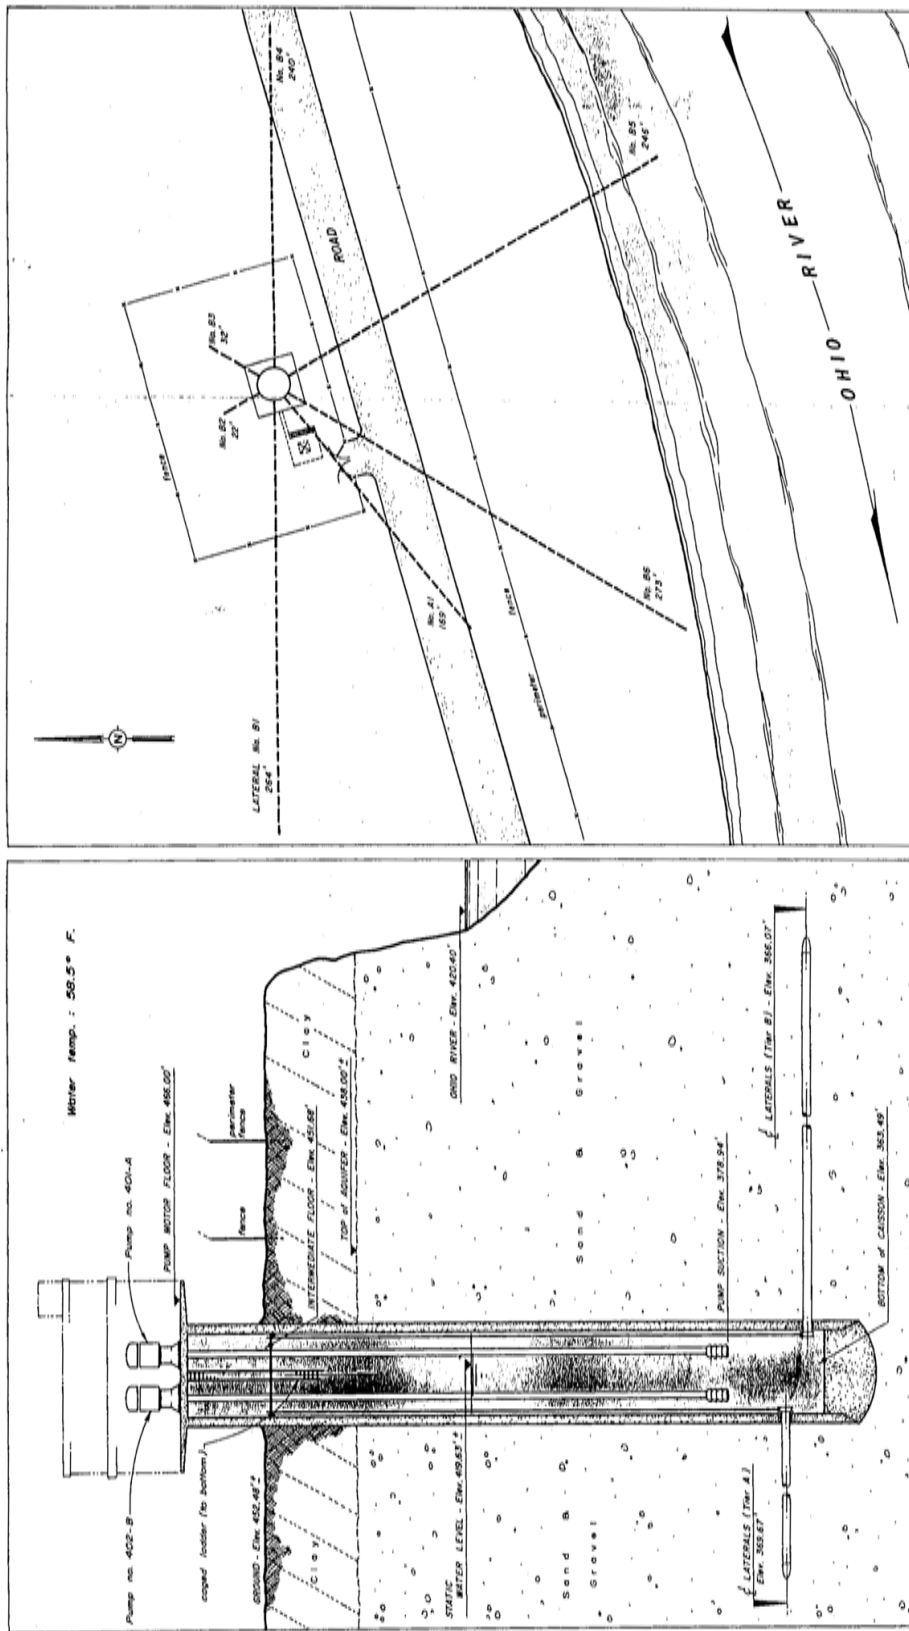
CW-6 Plan & Section (Ranney, 1979)
